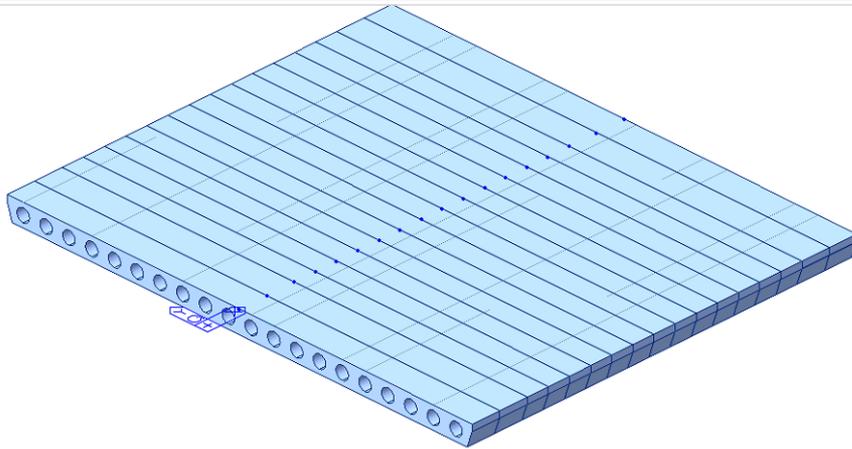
Structural Model of Post Tensioning Strands (Plan View)
